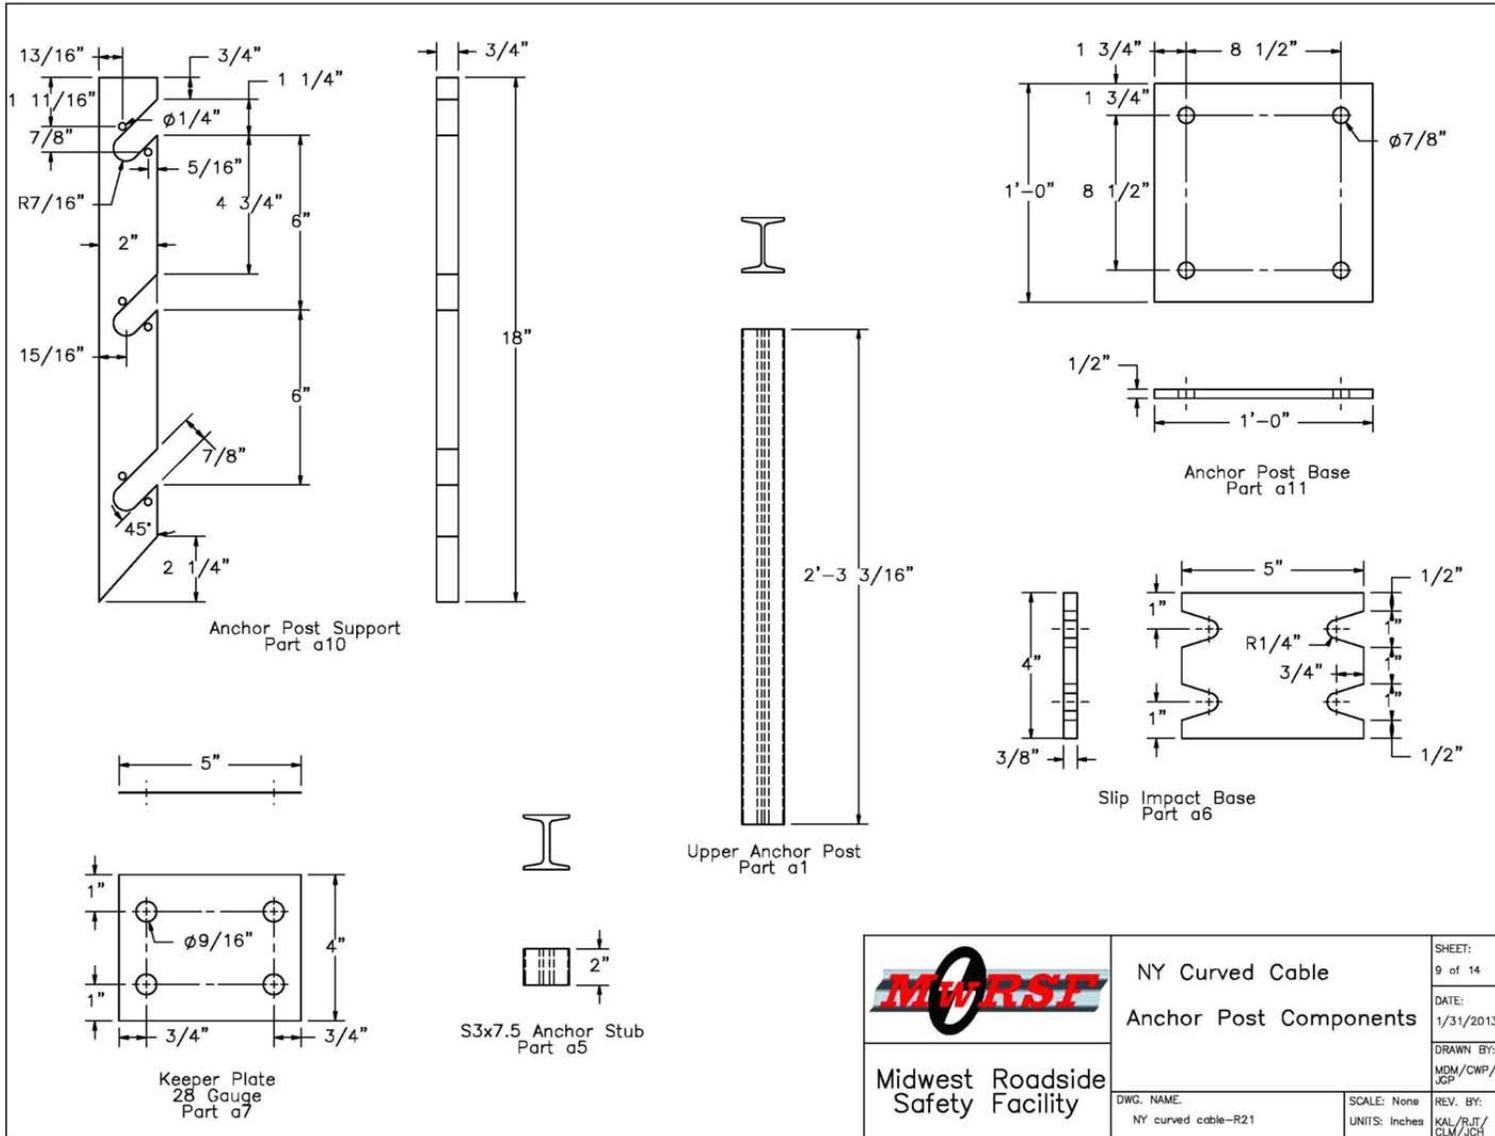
Anchor Post Component Details, Test No. NYCC-1
